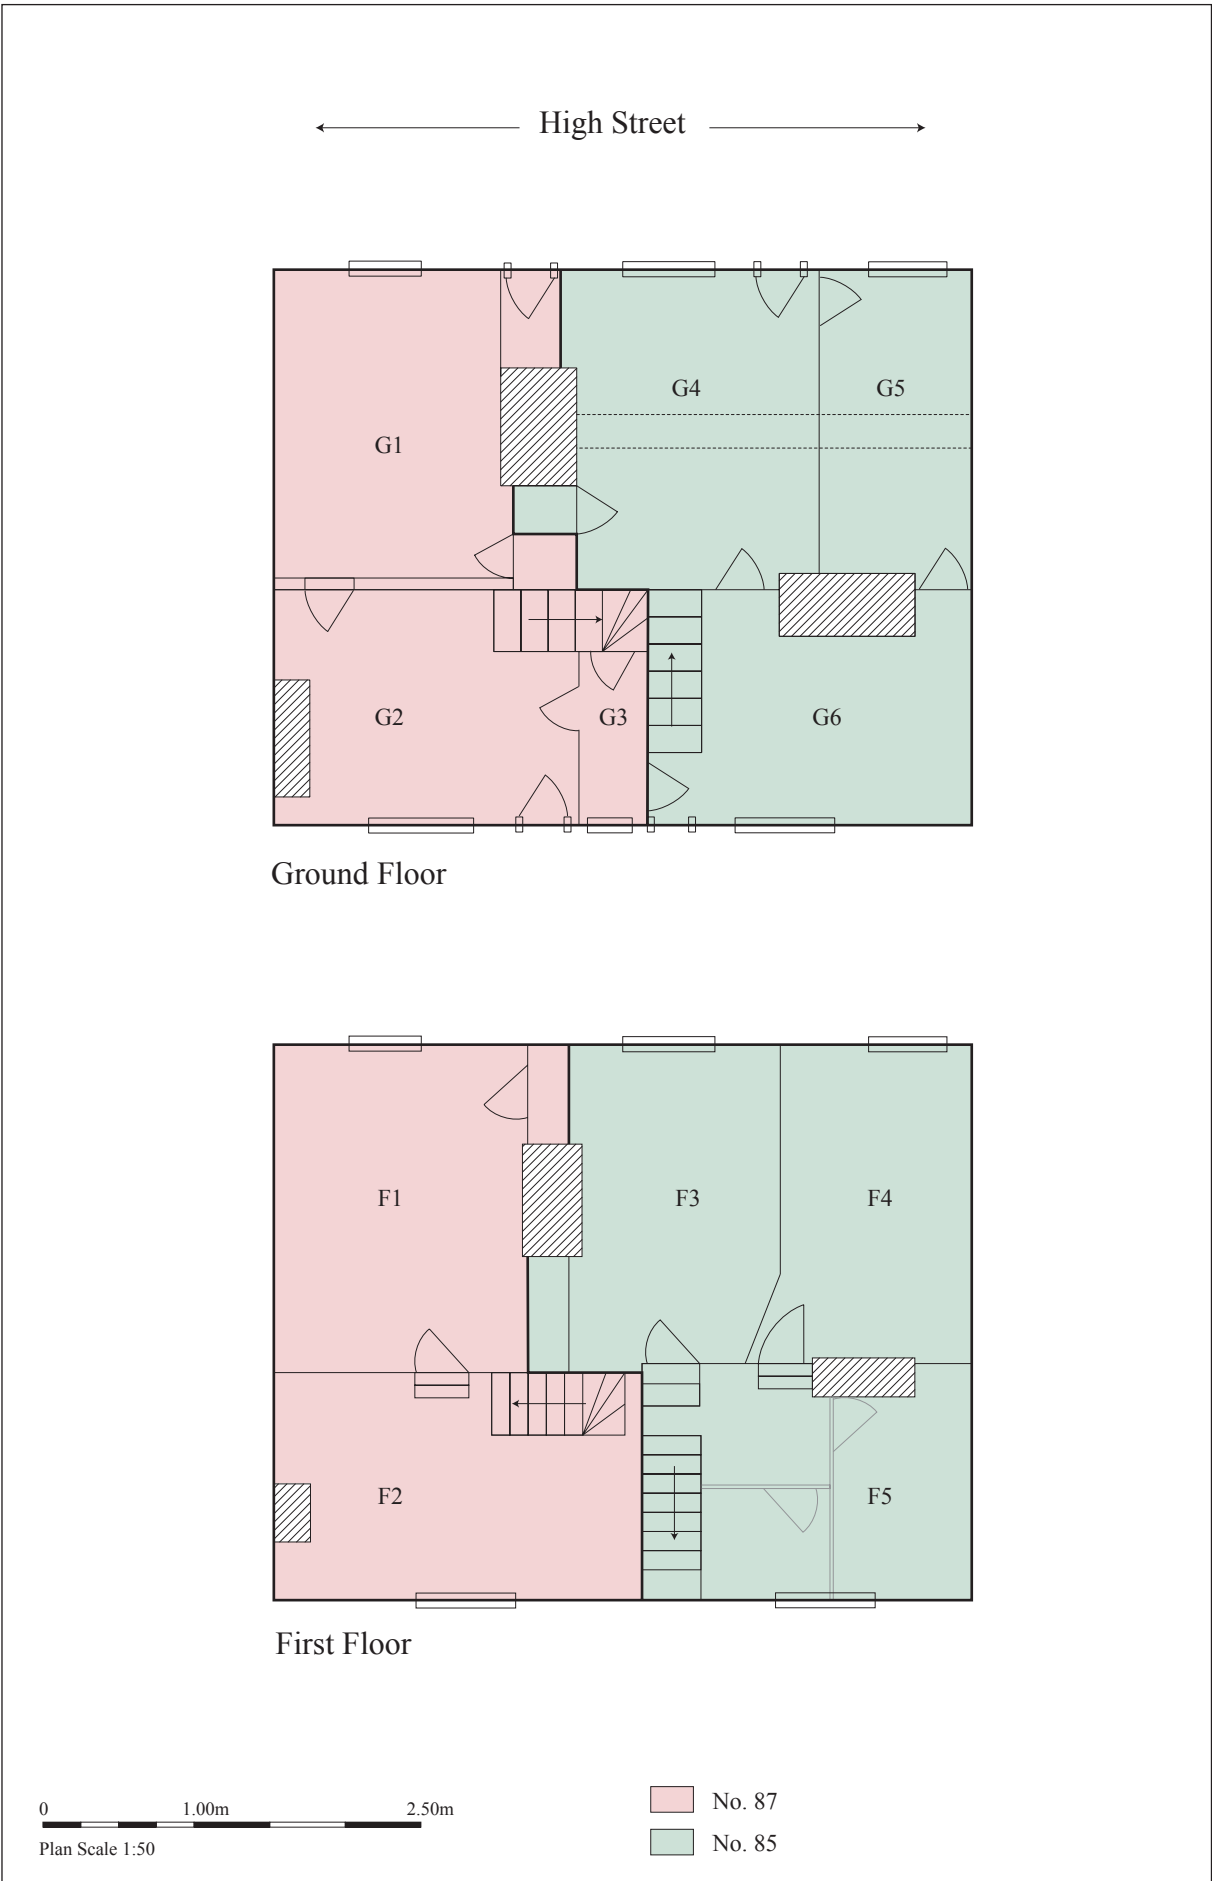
Floor plans of Nos. 85 and 87 High Street, Haverhill
